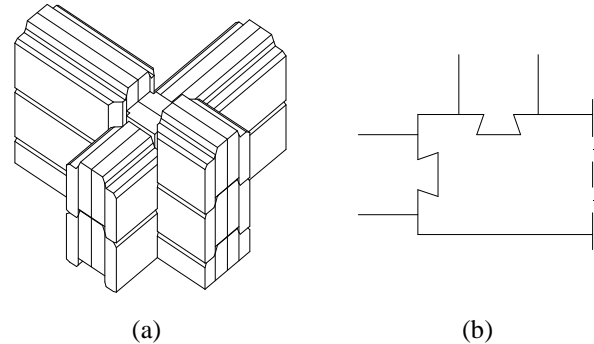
Possible interceptions between orthogonal log walls. (a) Two exterior walls through halved joints; (b) one exterior wall with an interior wall by dovetail joints
